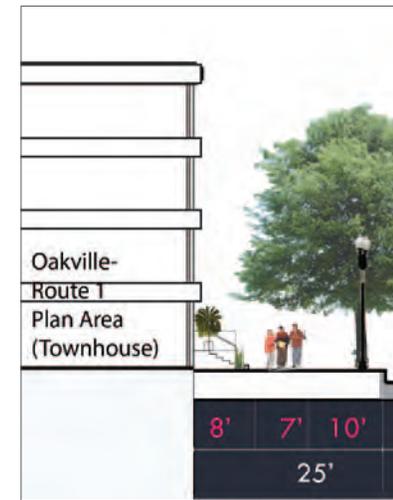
B: Route 1 Streetscape Cross-Section (Residential- Multifamily)
